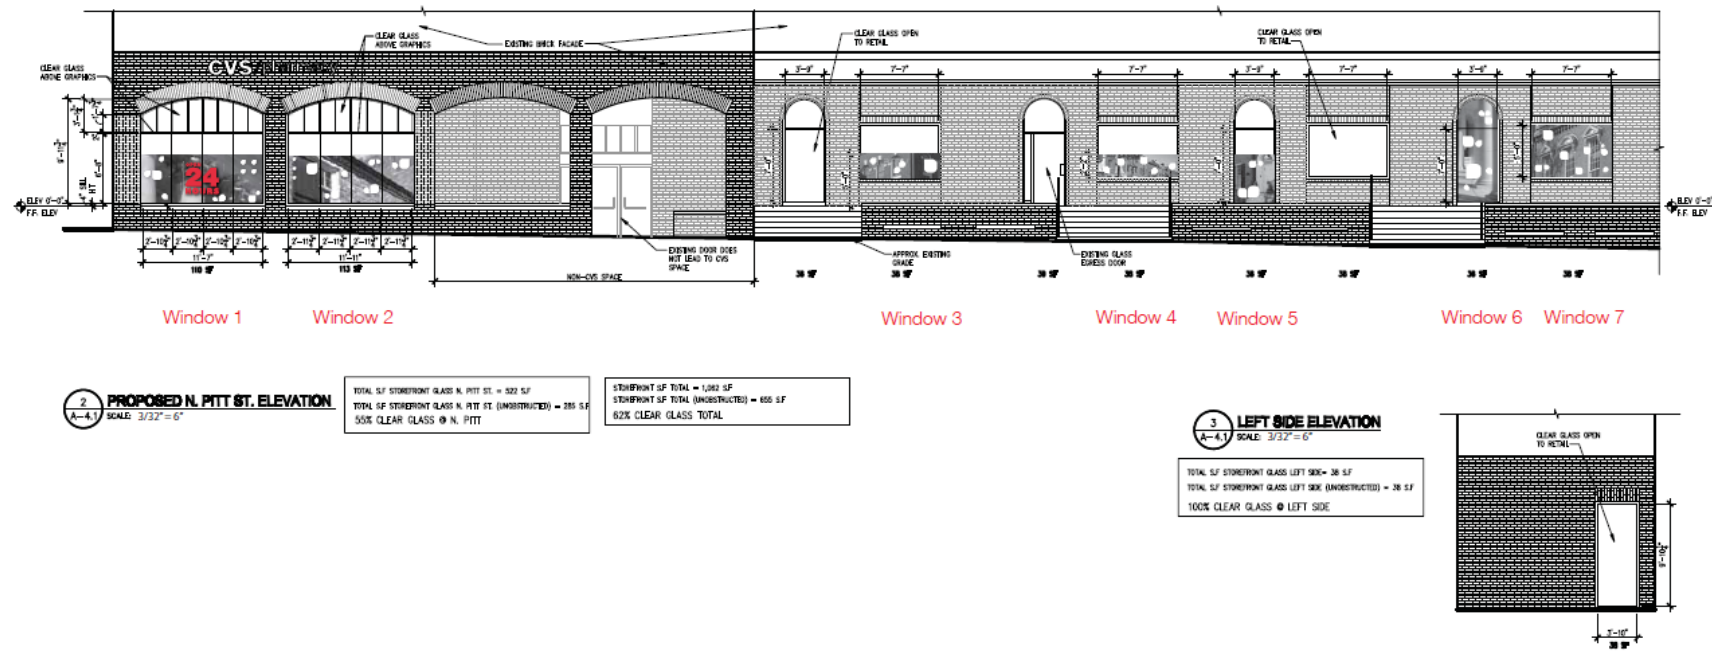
Proposed east (side) elevation (wall sign is not accurate) showing window alterations on North Pitt Street.
